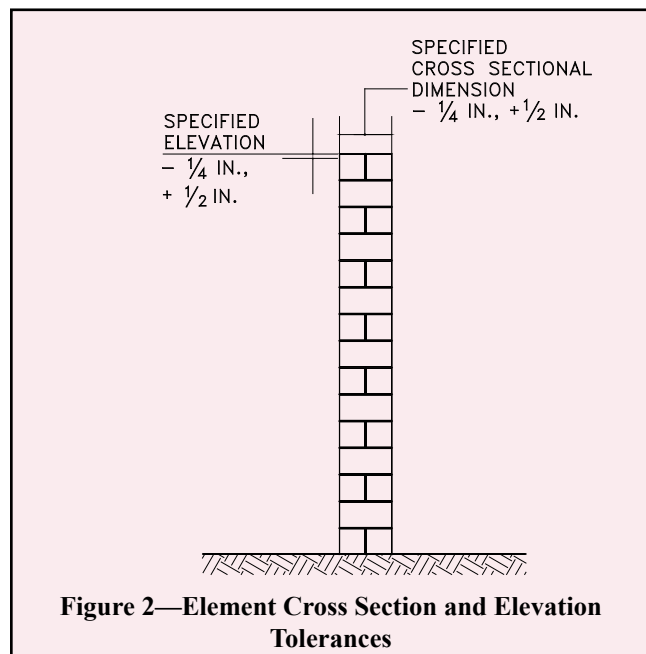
Element Cross Section and Elevation Tolerances
